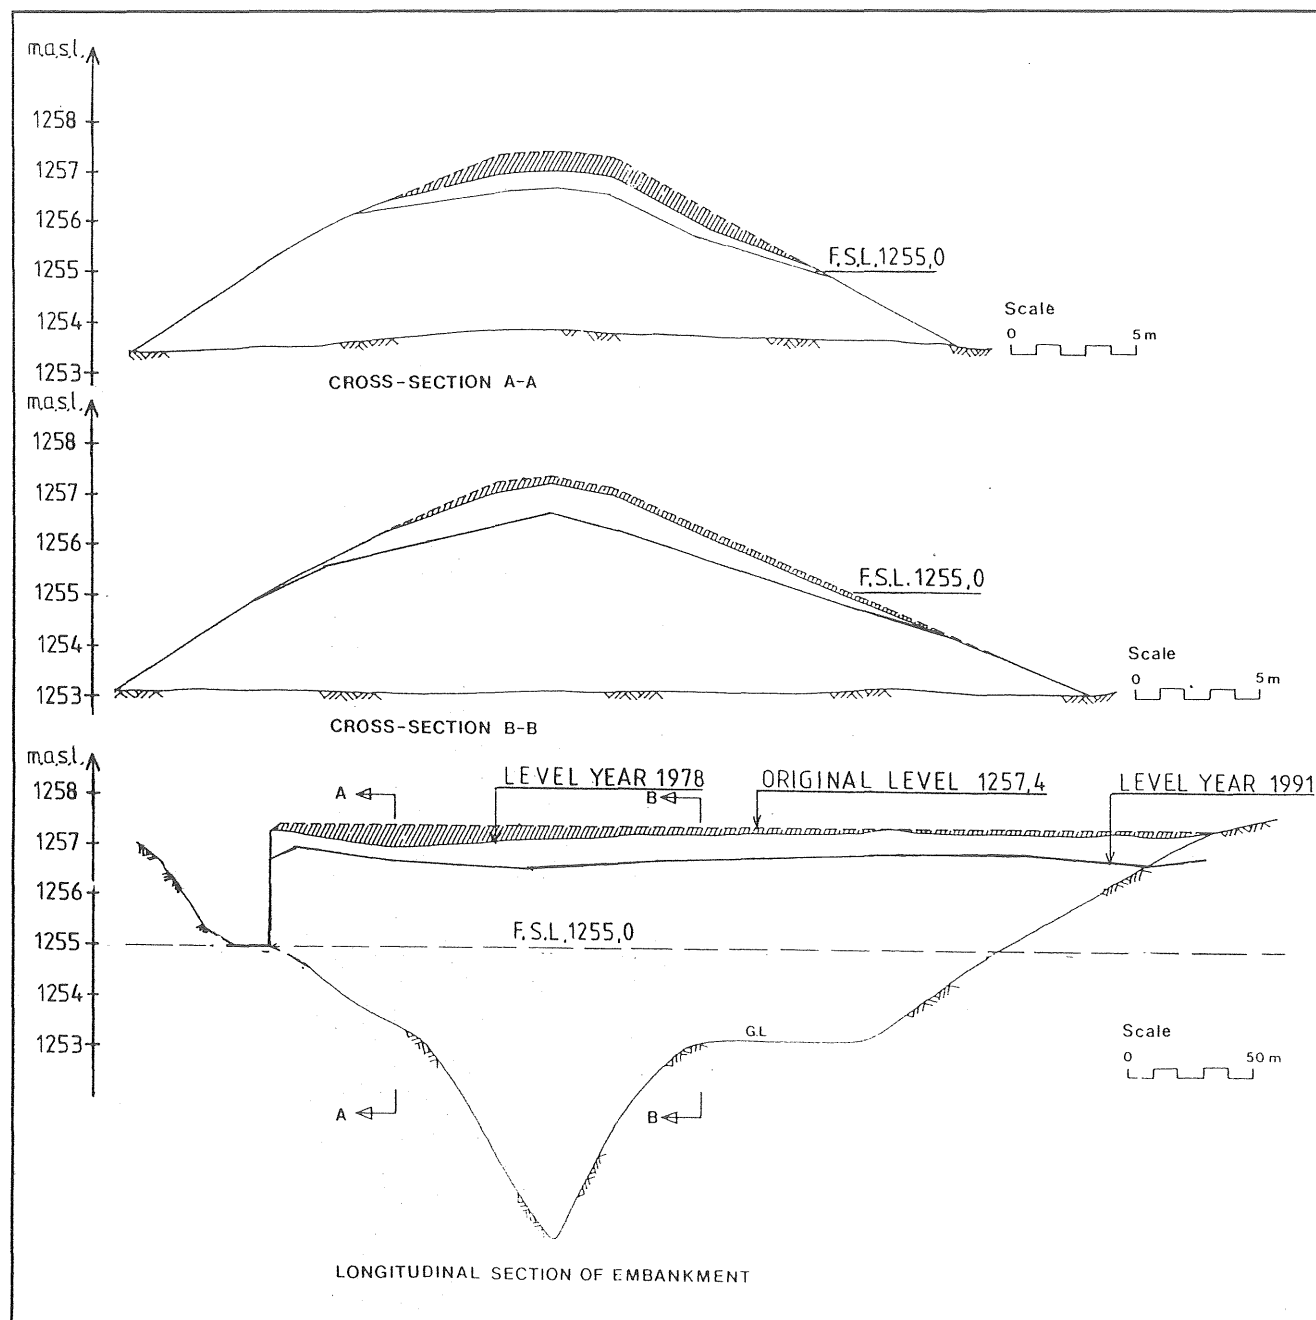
Site plan and longitudinal and cross sections. Embankment of the Ulaya Dam.
